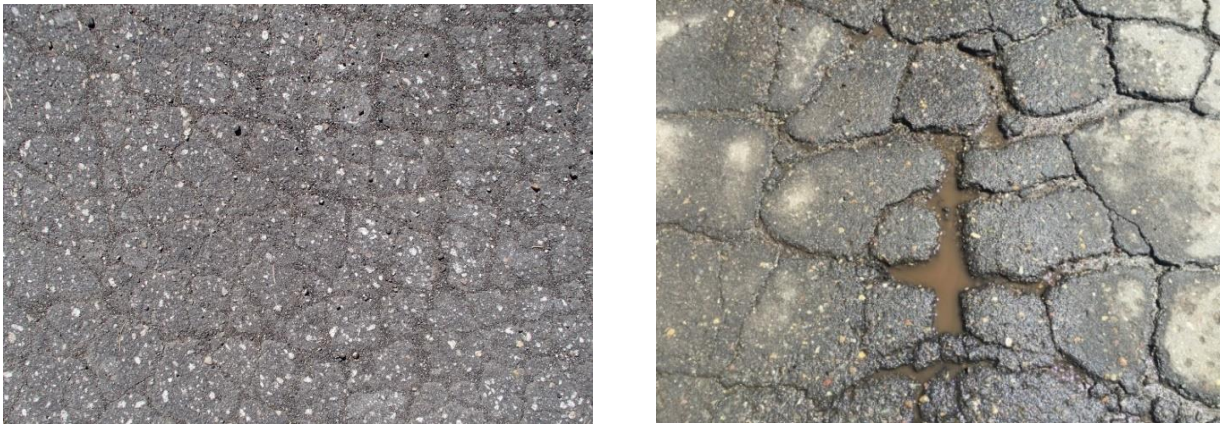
Fatigue cracks (left) and severely enlarged cracks (right) developed on asphalt pavement surface on Elks Club Drive in County.
